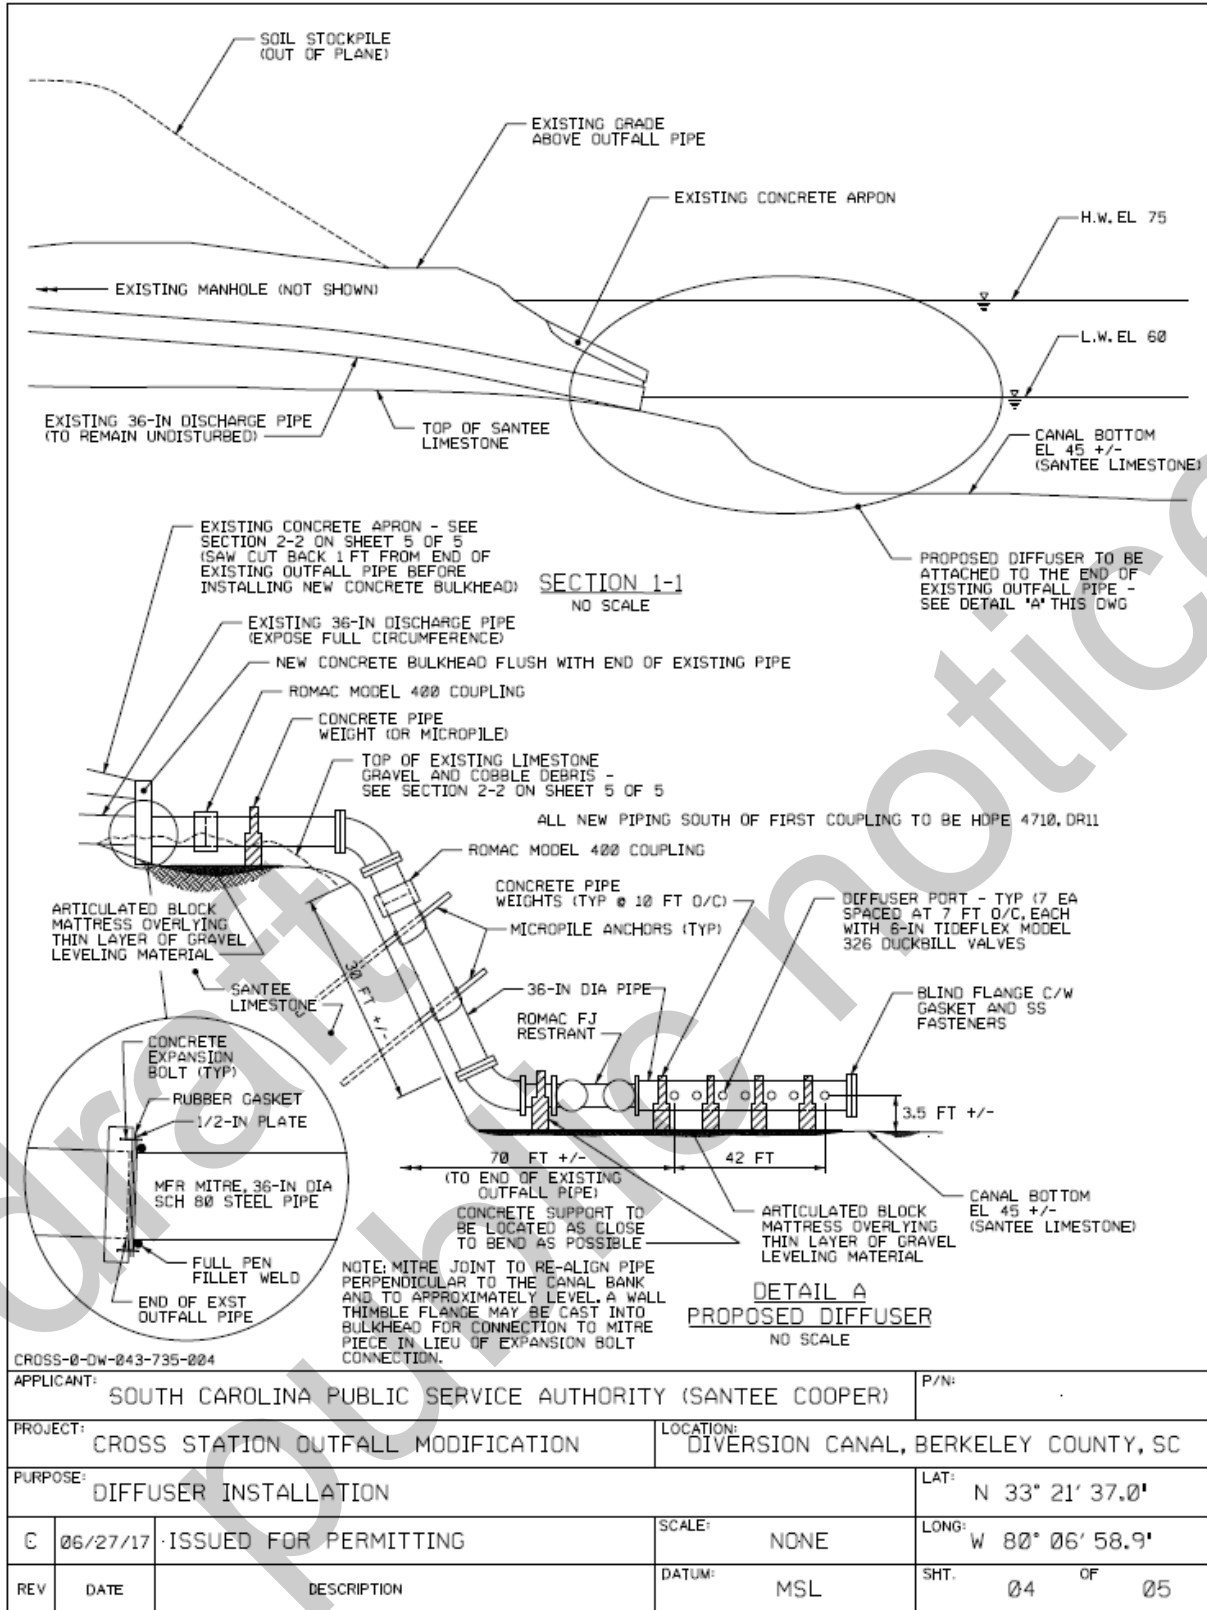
Profile view of new outfall diffuser (looking downstream)
